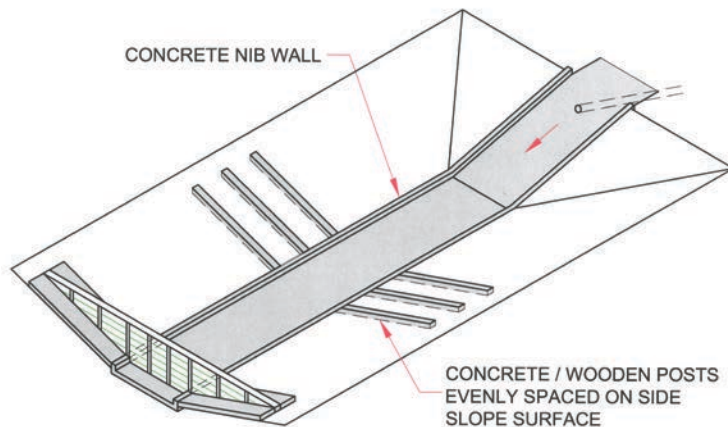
(a) Sludge Bed with Weeping wall: Concept Design (1)
